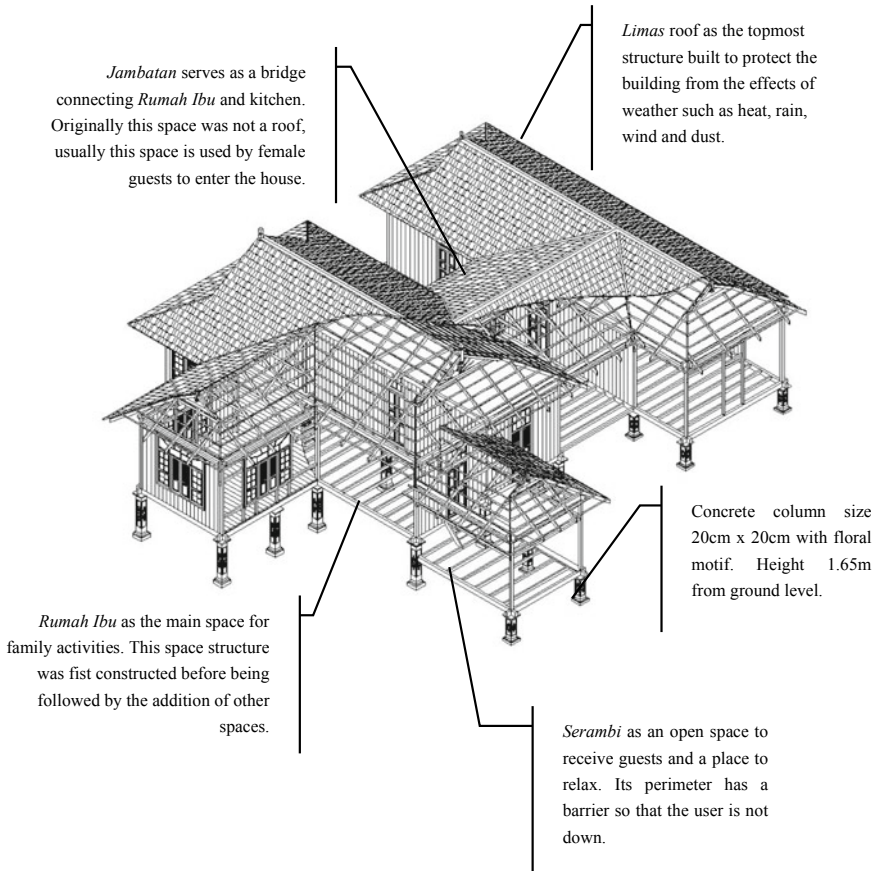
Construction structure of Daeng Haddadek house. *Source* Centre for the study of built environment in the Malay world (KALAM)
